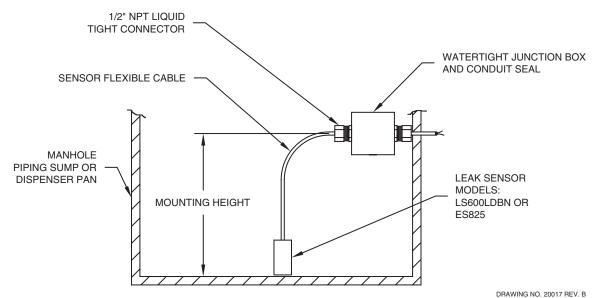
Leak Sensor Installation in Piping Sumps, Manholes, and Dispenser Pans
